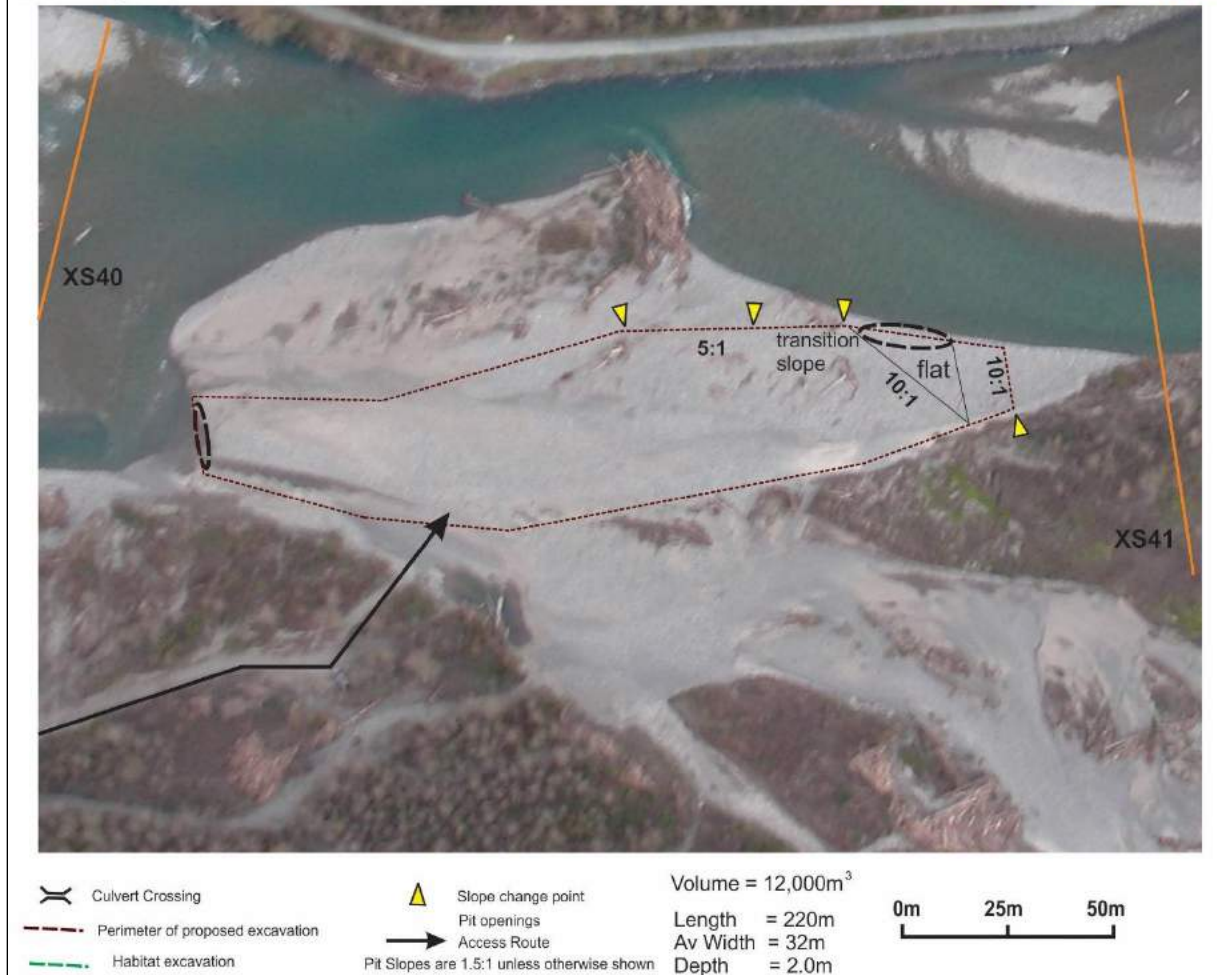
2016 Giesbrecht Bar (16-41L) construction drawing, August 11, 2016. Photo March 19, 2016.
